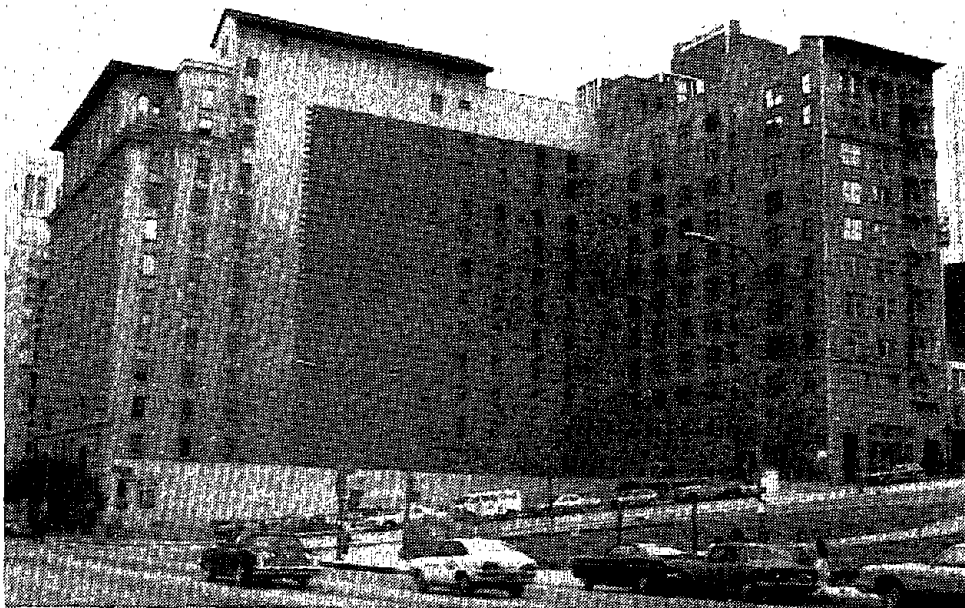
LARGE OFFICE BUILDING WITH URM WALLS, LOS ANGELES, CA.
